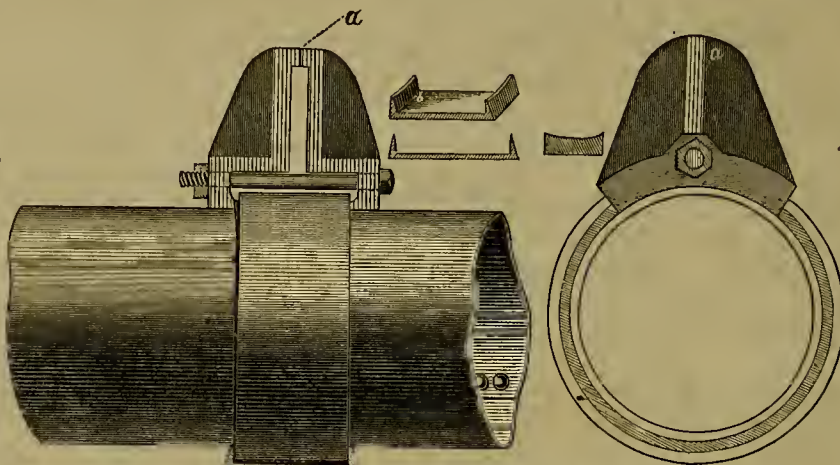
METHOD OF TIGHTENING LEAKY JOINTS.
